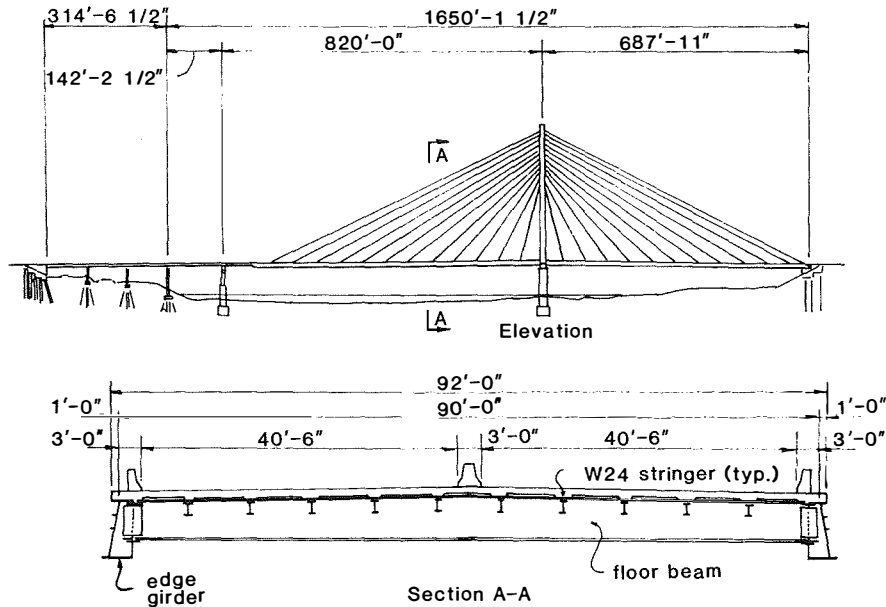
Weirton-Stuebenville Bridge, elevation and section.
